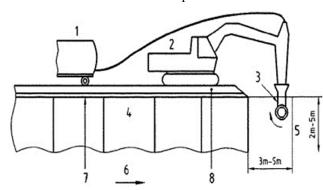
Diagram of mass stabilization on swamps and weak soils: 1 – tank with a stabilizer; 2 – working machine; 3 – mixer; 4 – treated weak soil; 5 – peat or weak soil; 6 – direction of mass stabilization; 7 - unwoven material; 8 backfilled gravel
